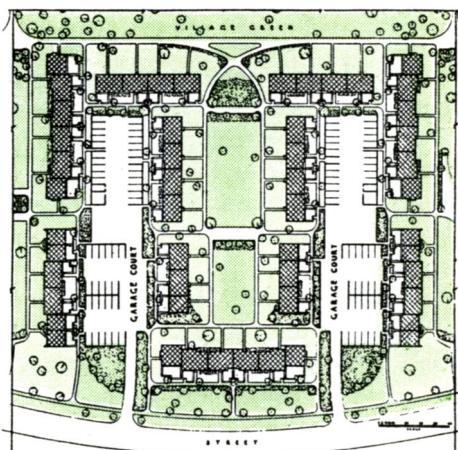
Baldwin Hills Village. Plan and Site of a Garden Court and Garage Courts
